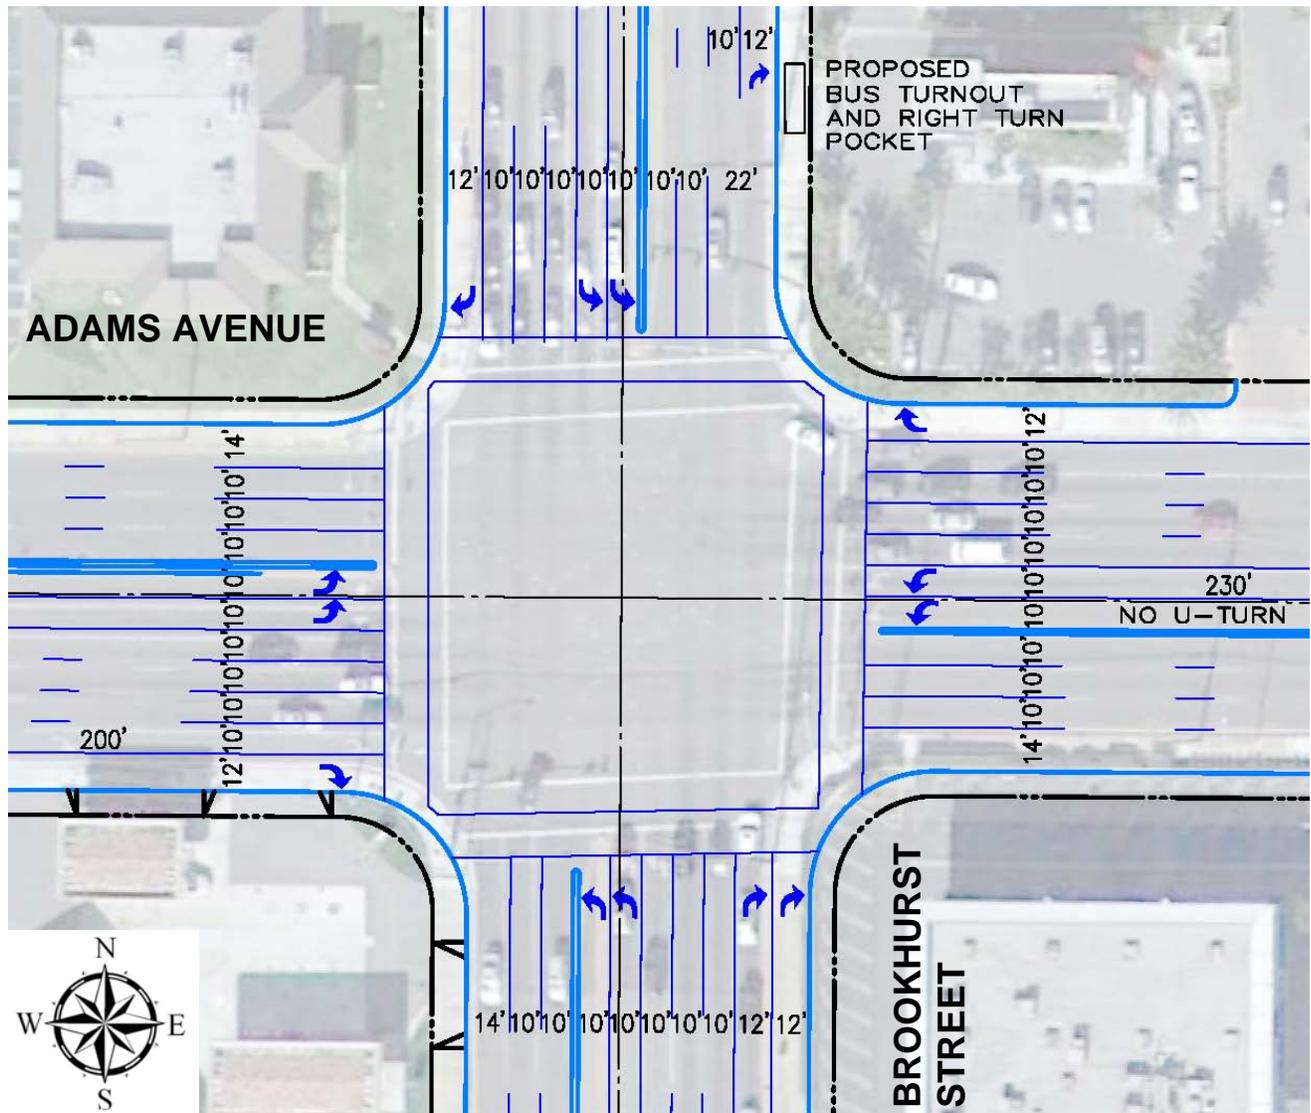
Proposed Alternative 1 Intersection Layout (10' wide thru lanes)
